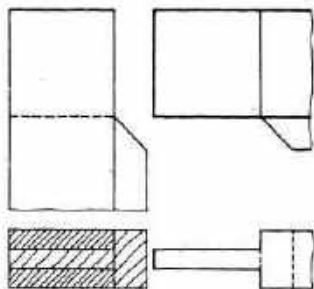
LAY OUT OF A GROOVED PANEL FRAME
